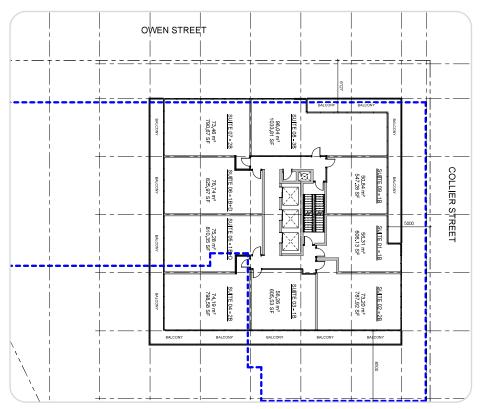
Level 12-27 Floor Plan, prepared by Scott Shields Architects Inc.
